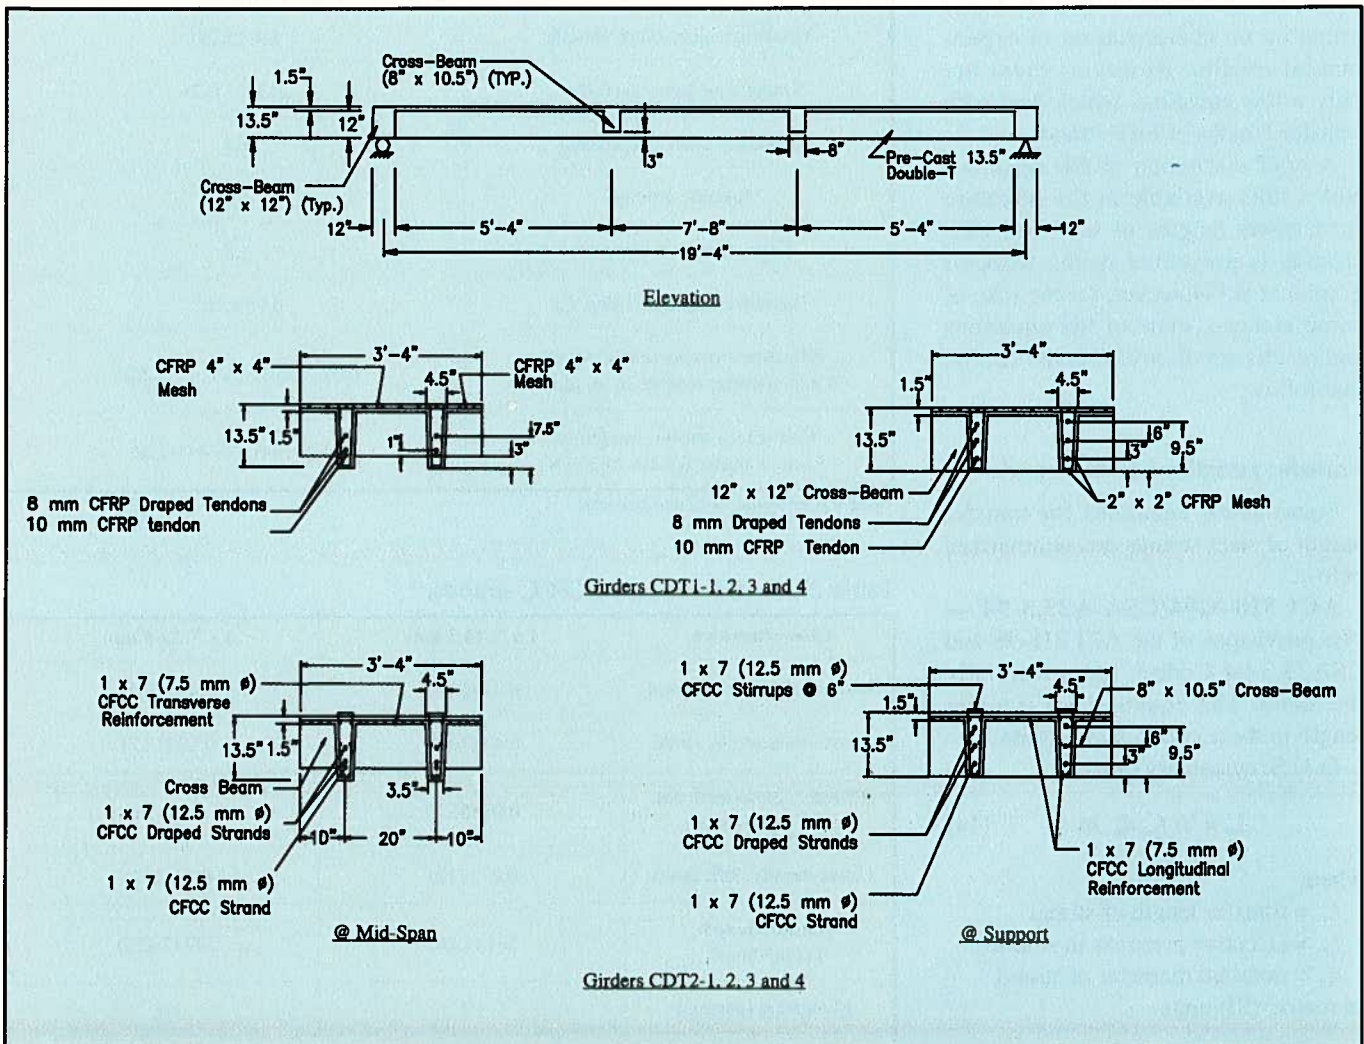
Details of pretensioned, prestressed concrete DT girders.
